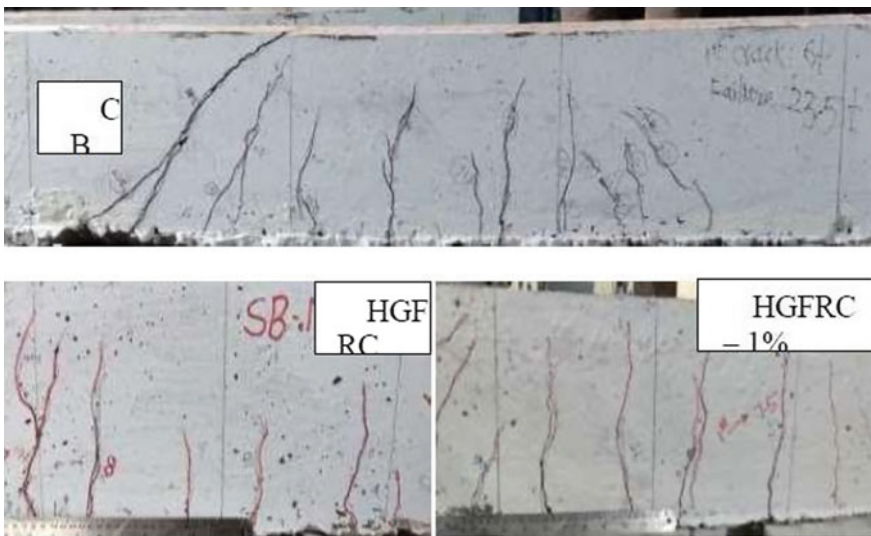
Crack spacings of control beam (CB), HGFRC, HGFRC-1% reinforcement
